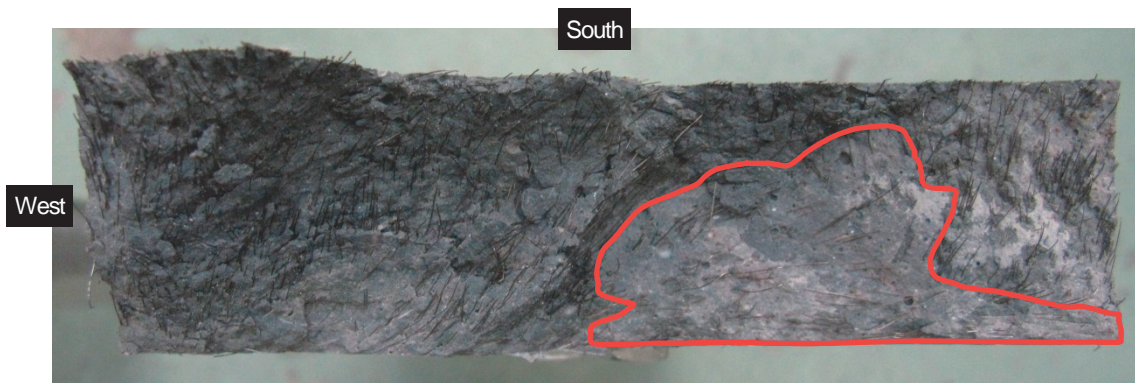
Fatigue fracture surface of S2.5-1 test specimen (upper half of the fractured specimen)
